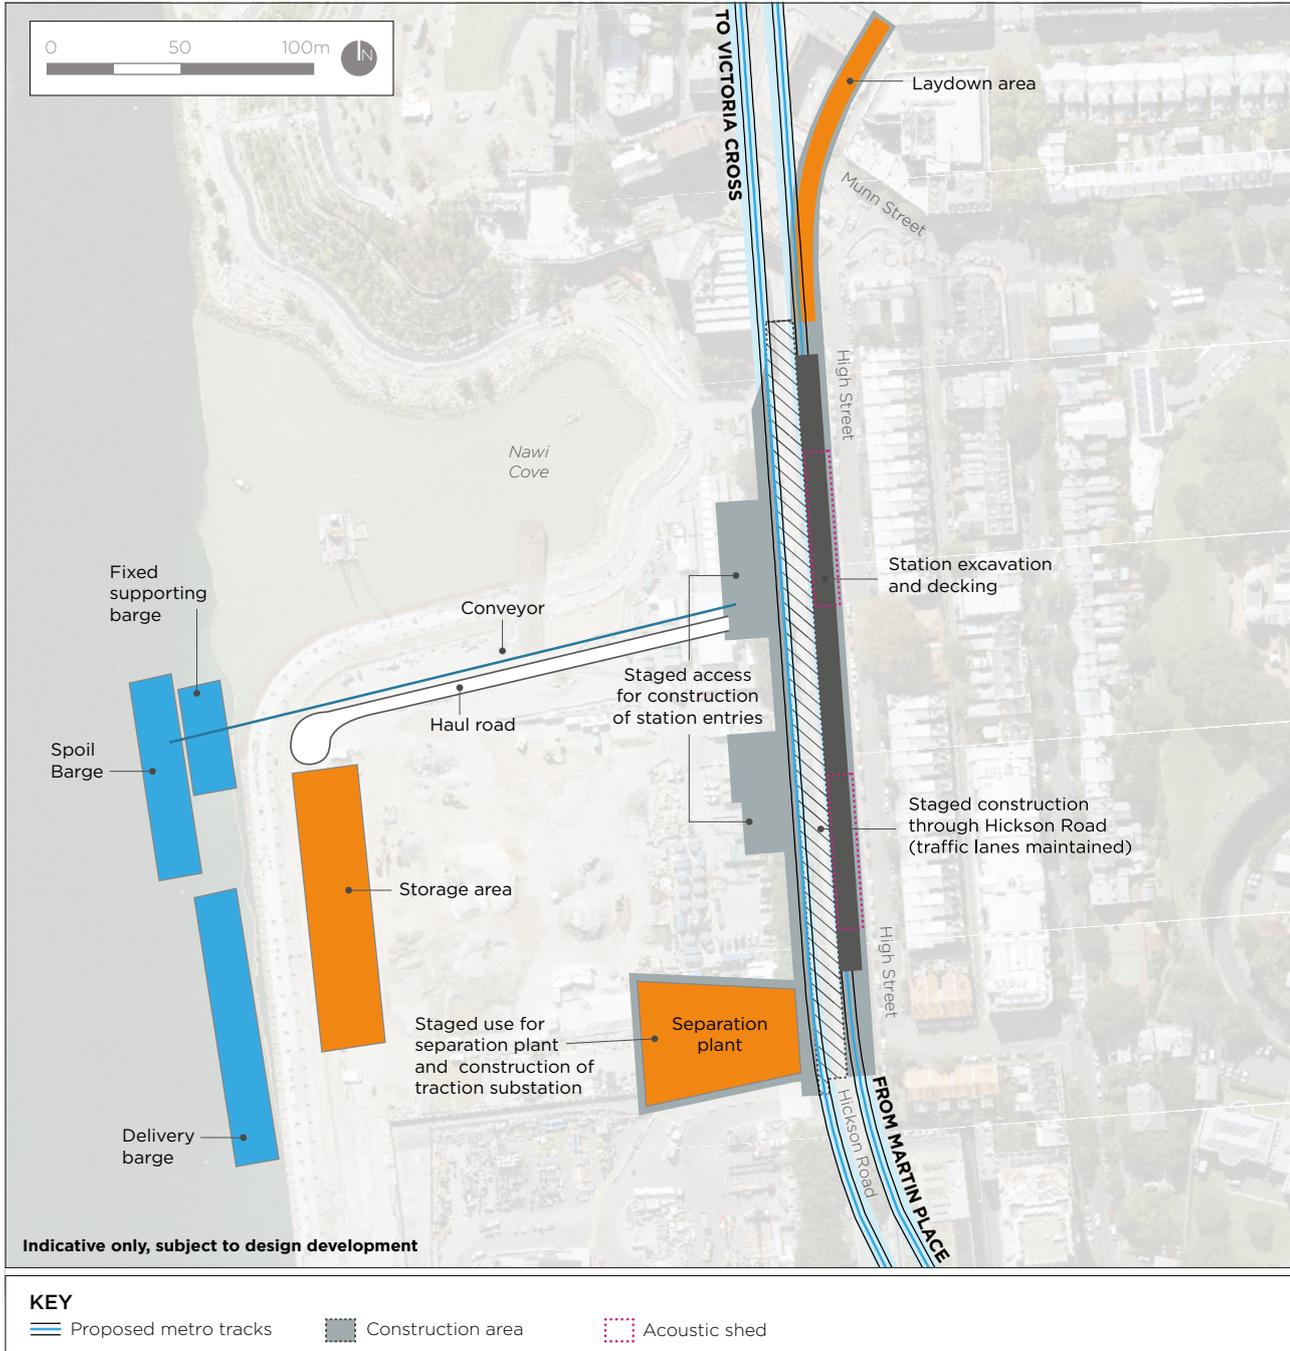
Barangaroo Station – location and layout of barging infrastructure
